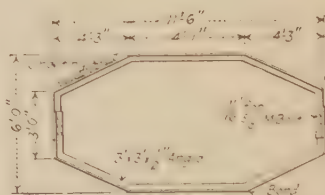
Plan of angle iron frame to support sheathing for excavating manhole.
